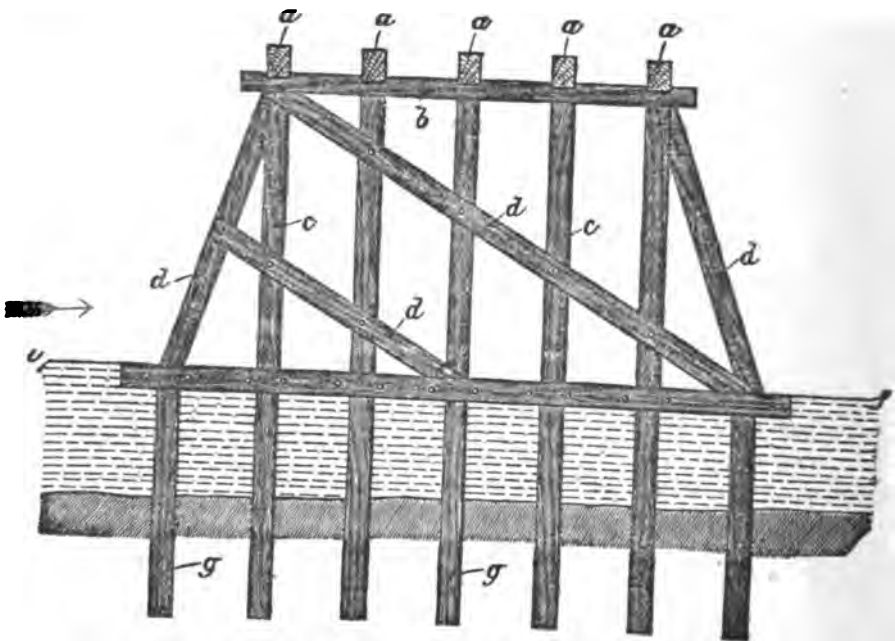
is an elevation of a pier consisting of a single row of piles and posts for a cart-road (after Tredgold). *a, a* are the longitudinal beams of the bridge. These rest on a cross piece *b*, which forms the head of the pier ; *c, c* are the upright posts of which the pier is made ; *d, d* are struts, added to stiffen the construction ; *e, f* is the level of the water ; *g, g* are the piles which are driven into the river-bed. The arrow shows the direction of the stream.
